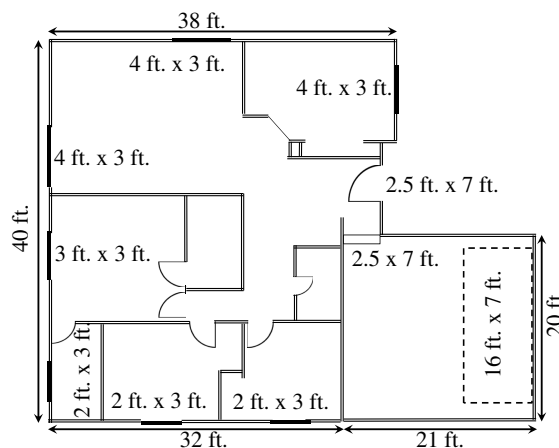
Plan view of the benchmark building (1 ft = 0.305 m)
